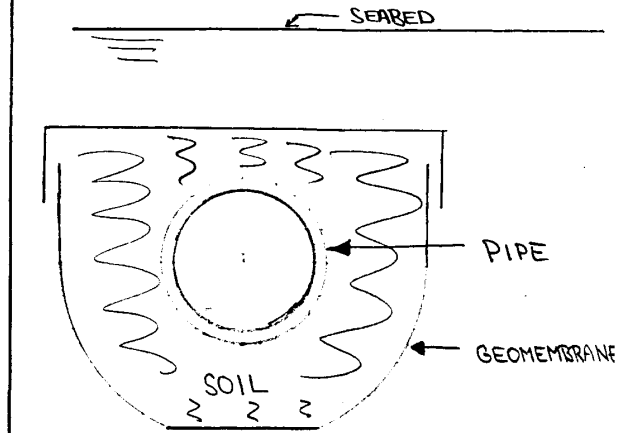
GEOMEMBRANE WRAP AROUND A LAYER OF SOIL
